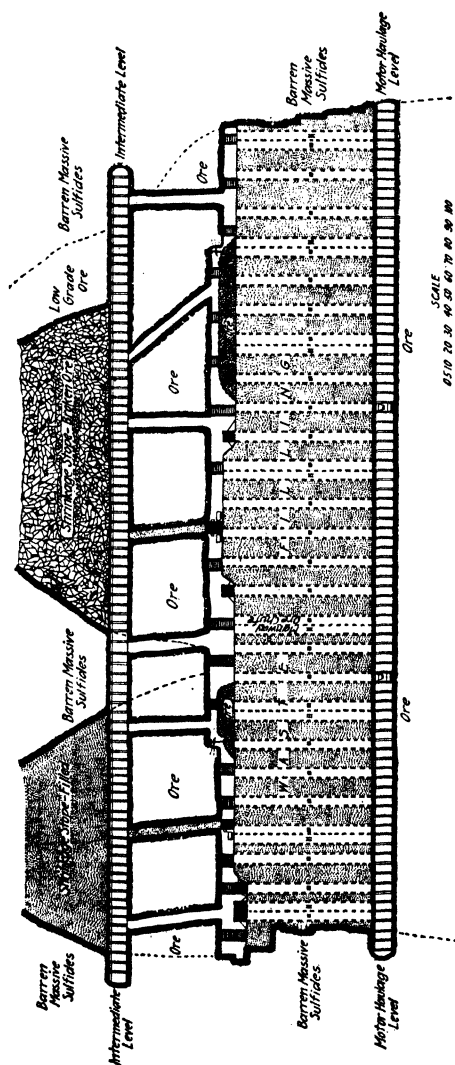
LONGITUDINAL SECTION—HORIZONTAL CUT-AND-FILL STOPE.
